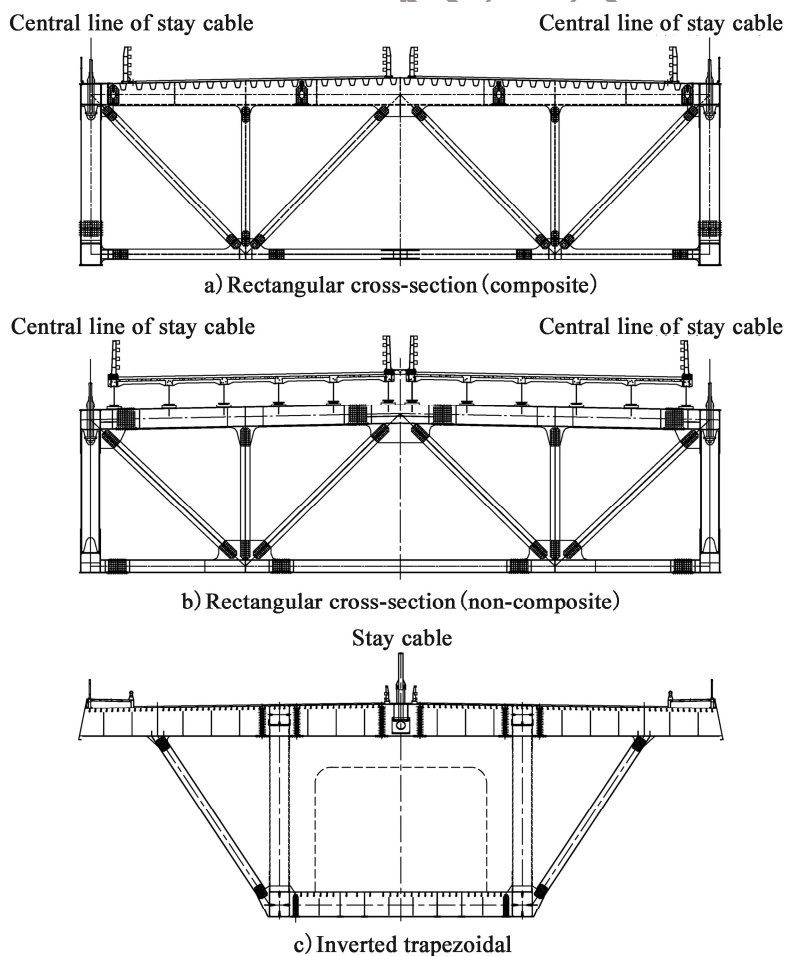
Typical cross sections of steel truss in cable-stayed bridges
